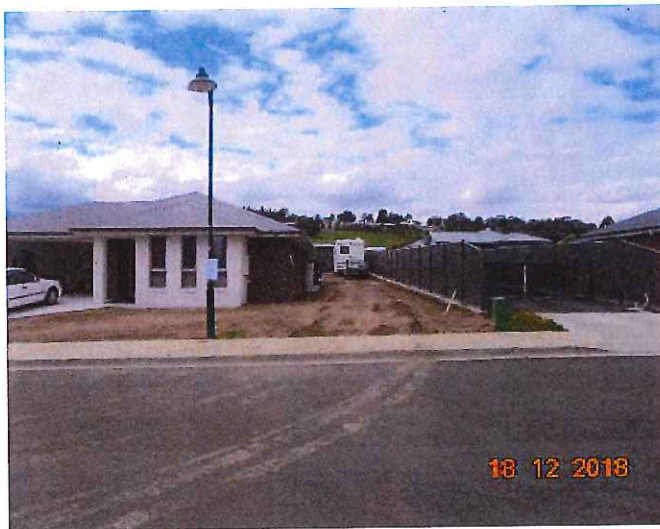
Site distance available looking east up Seccombe Street (Google Earth)
